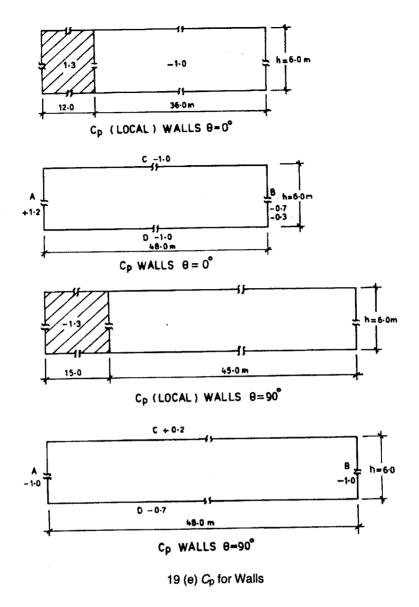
BUILDING WITH MULTISPAN SAW TOOTH SPEED ROOF (Continued)
